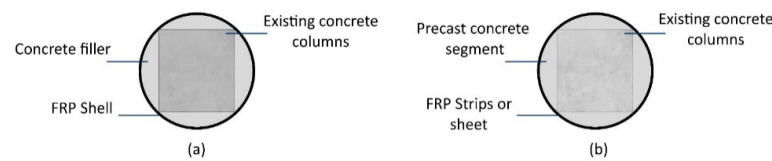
Transformation methods of non-circular columns: (a) placing prefabricated FRP shells and (b) using precast concrete segments.
